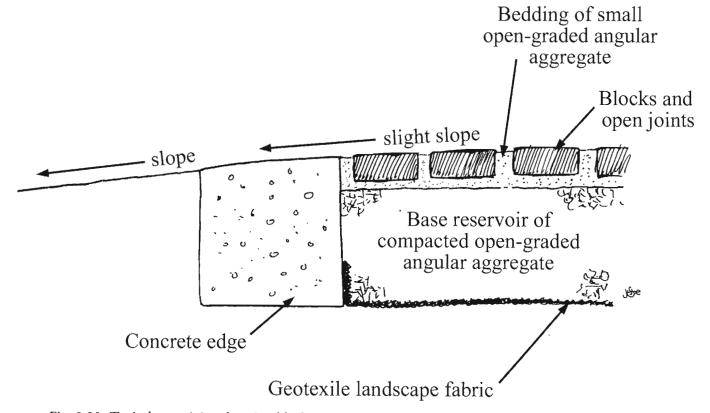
Typical open-jointed paving block construction components. Adapted from Porous Pavements³⁷
